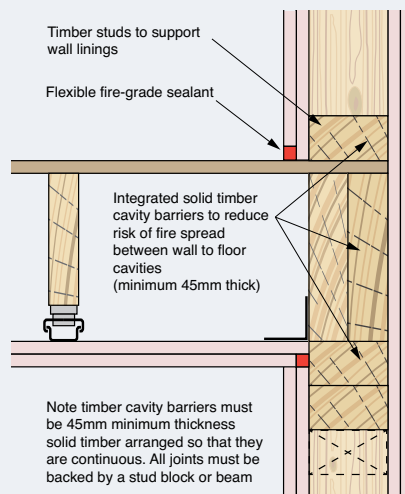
Fire-protected single stud timber frame wall /floor junction with integral cavity barriers – beams parallel to wall Class 2 building.
